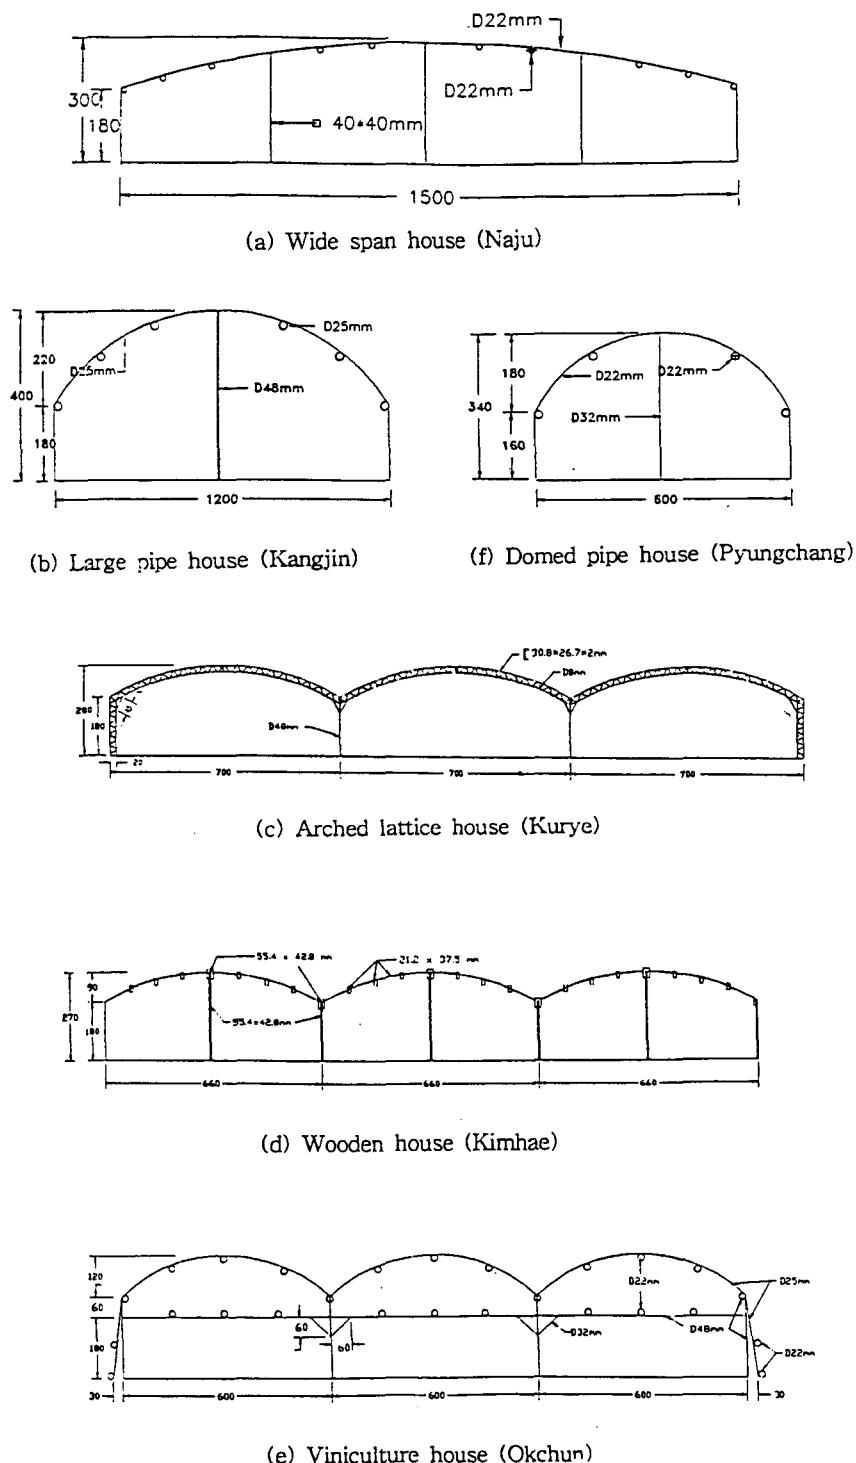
Cross sectional shape and scale of characterized greenhouses.(unit : cm)
